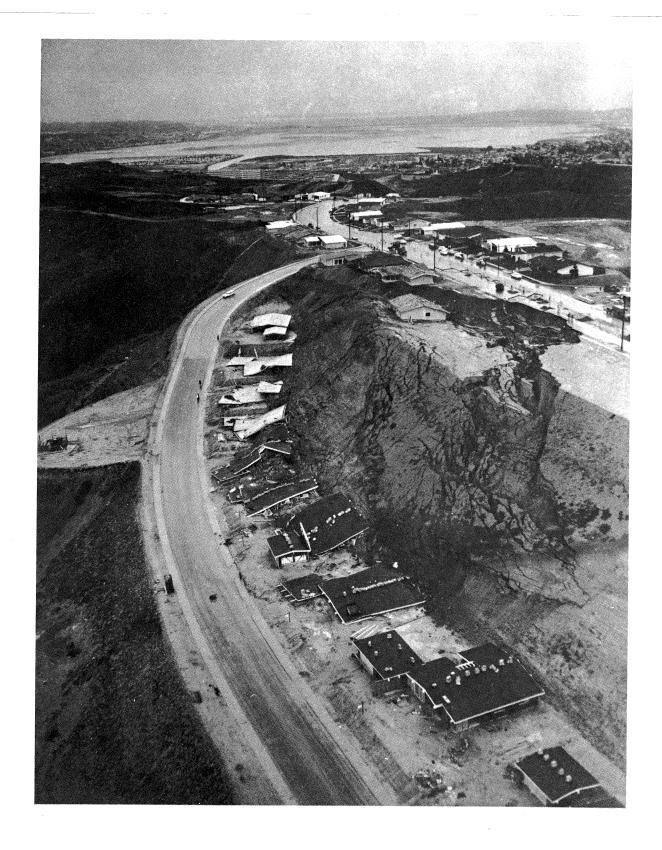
View of Mount Soledad landslide of December 14, 1961, looking toward the south. Landslide destroyed seven homes under construction near the intersection of Desert View Drive and Soledad Mountain Road. Failure was due principally to oversteepening of faulted and jointed, Eocene Ardath Shale inclined in the same general direction as the cut slope. Photograph from Union-Tribune Publishing Co., San Diego, CA.
